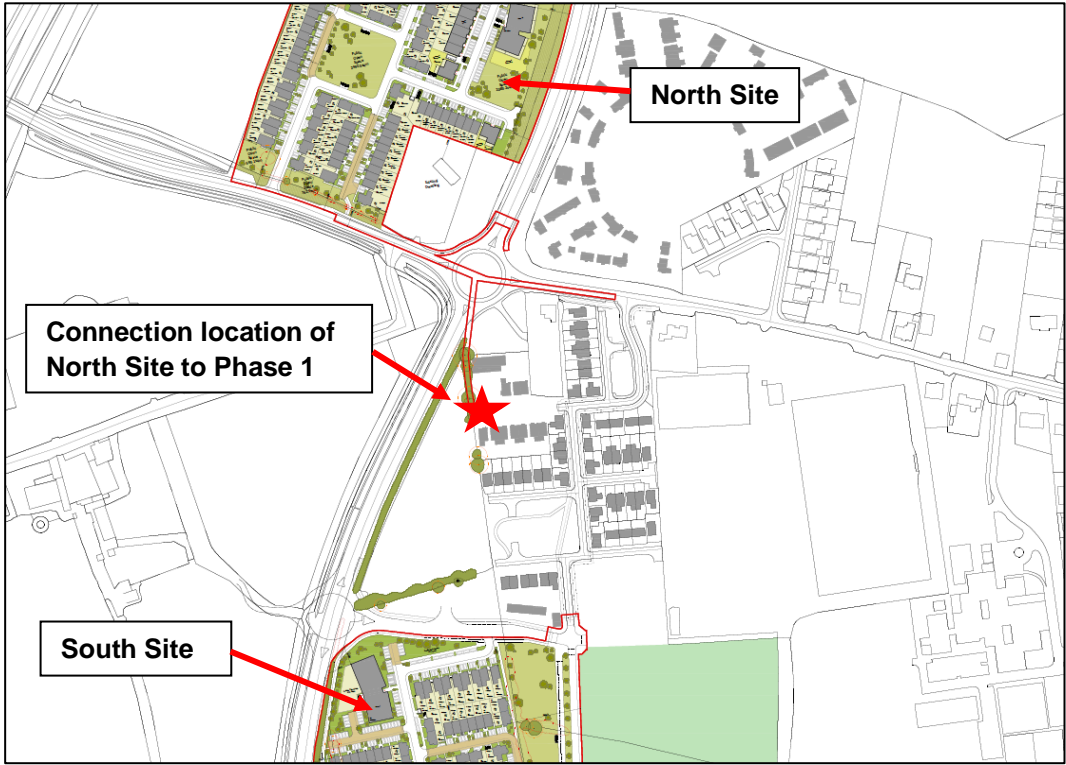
Phase 2 North Site Foul Connection Location at Phase 1
